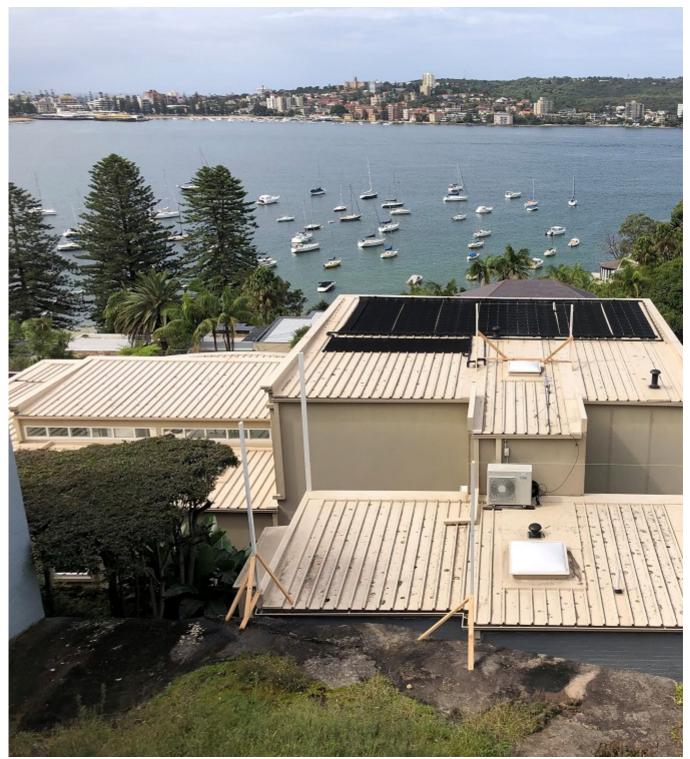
View from No. 4a Tutus Street upper floor balcony.
